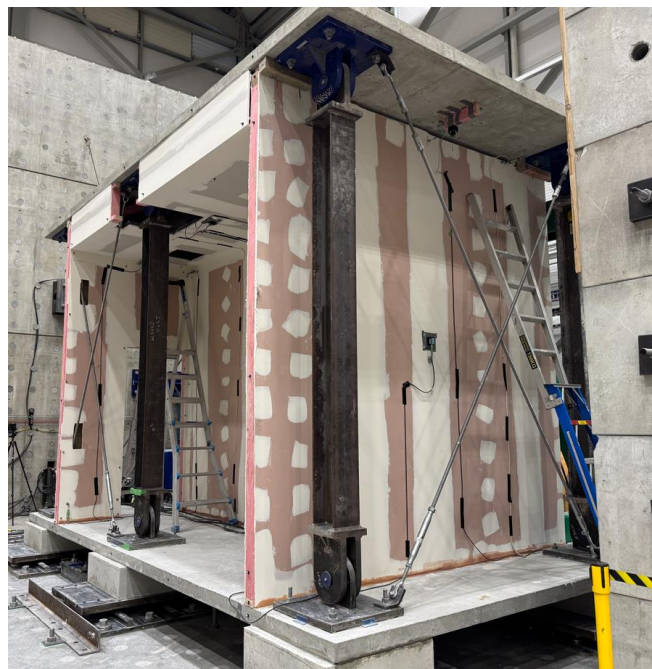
Photo of constructed specimen (Northeast elevation)
